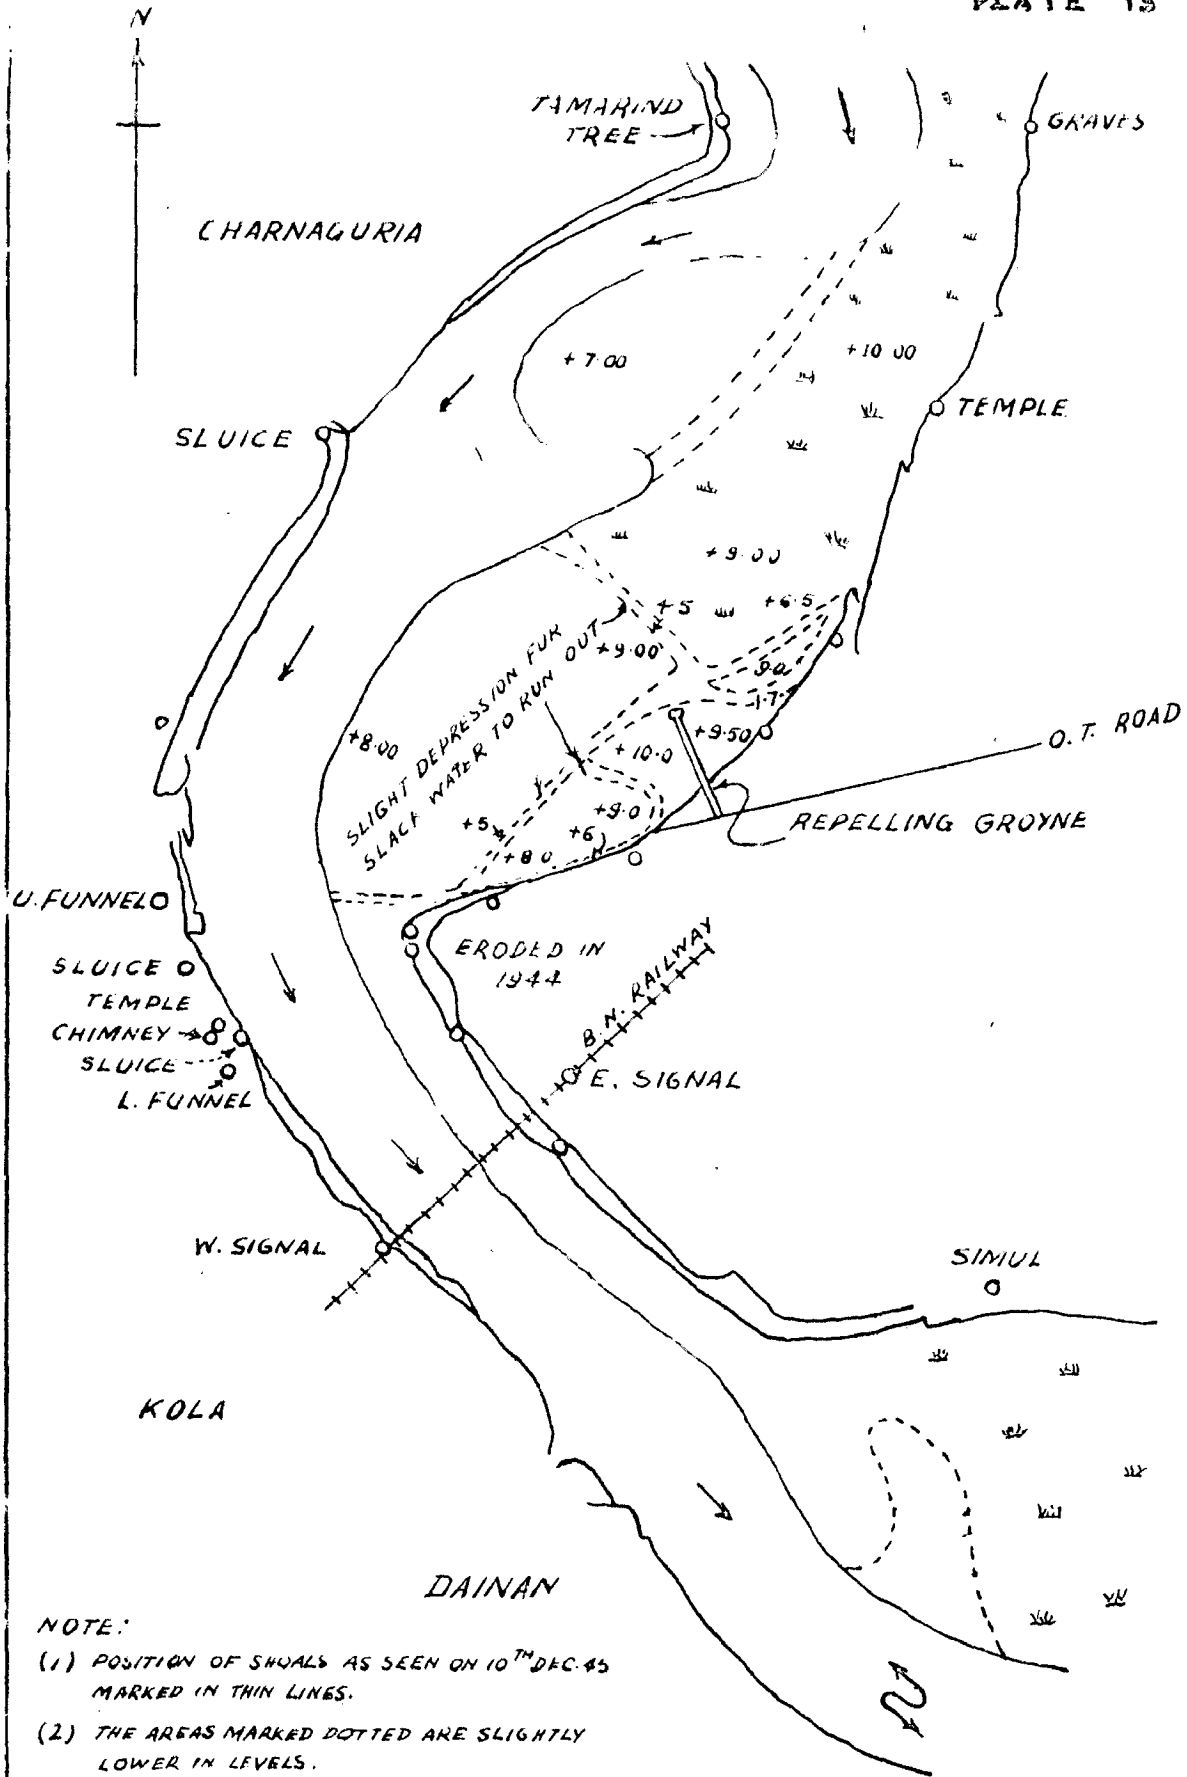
PLAN SHOWING EROSION AT BUAN FROM RIVER GANGA
